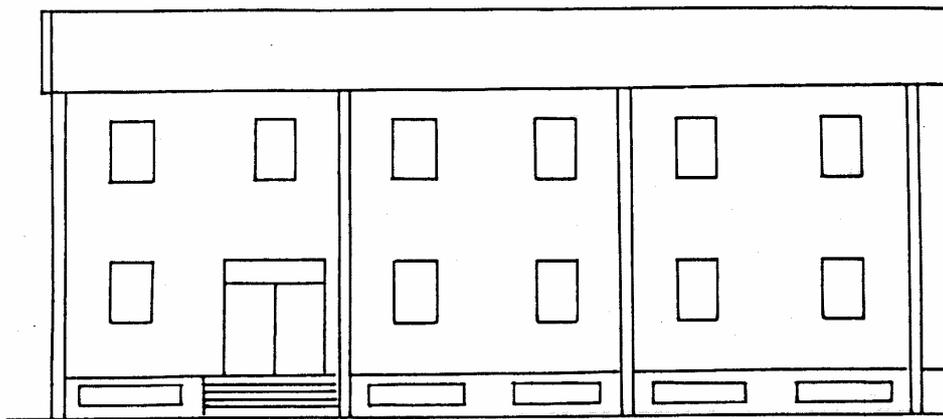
TYPICAL ELEVATION OF A LABORATORY BUILDING
